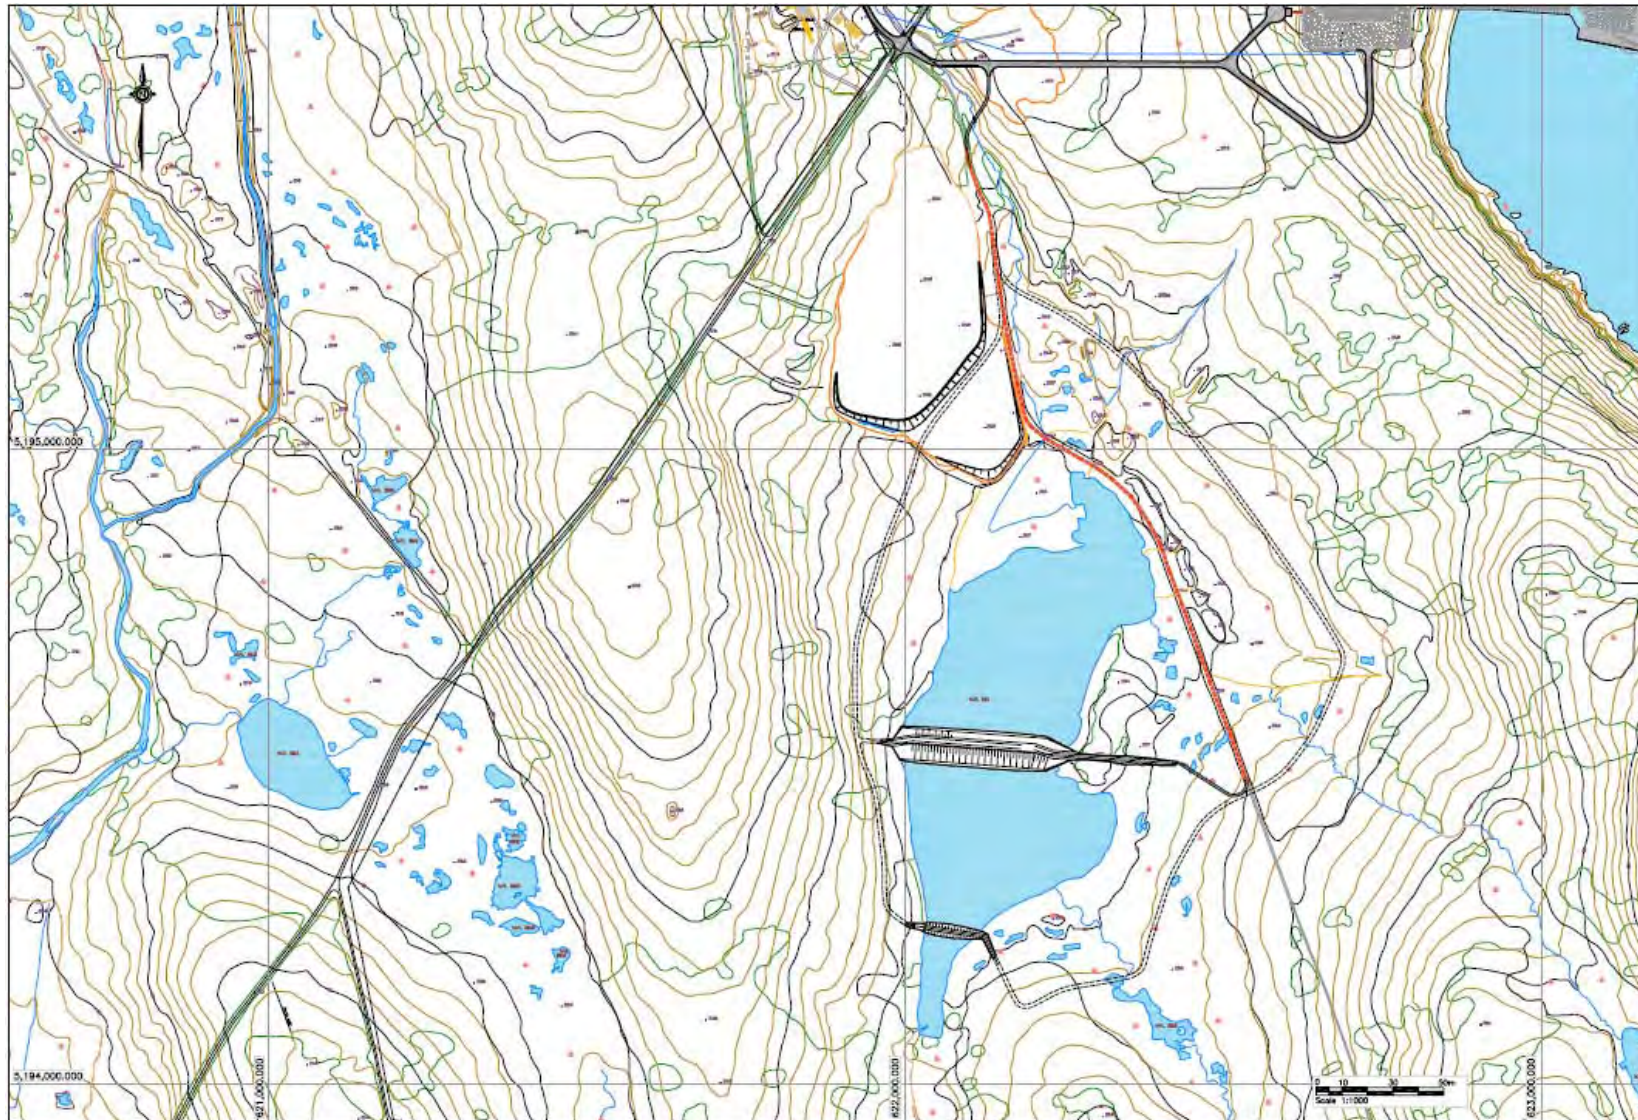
Proposed Tailings Impoundment and Associated Facilities Site Location Plan
